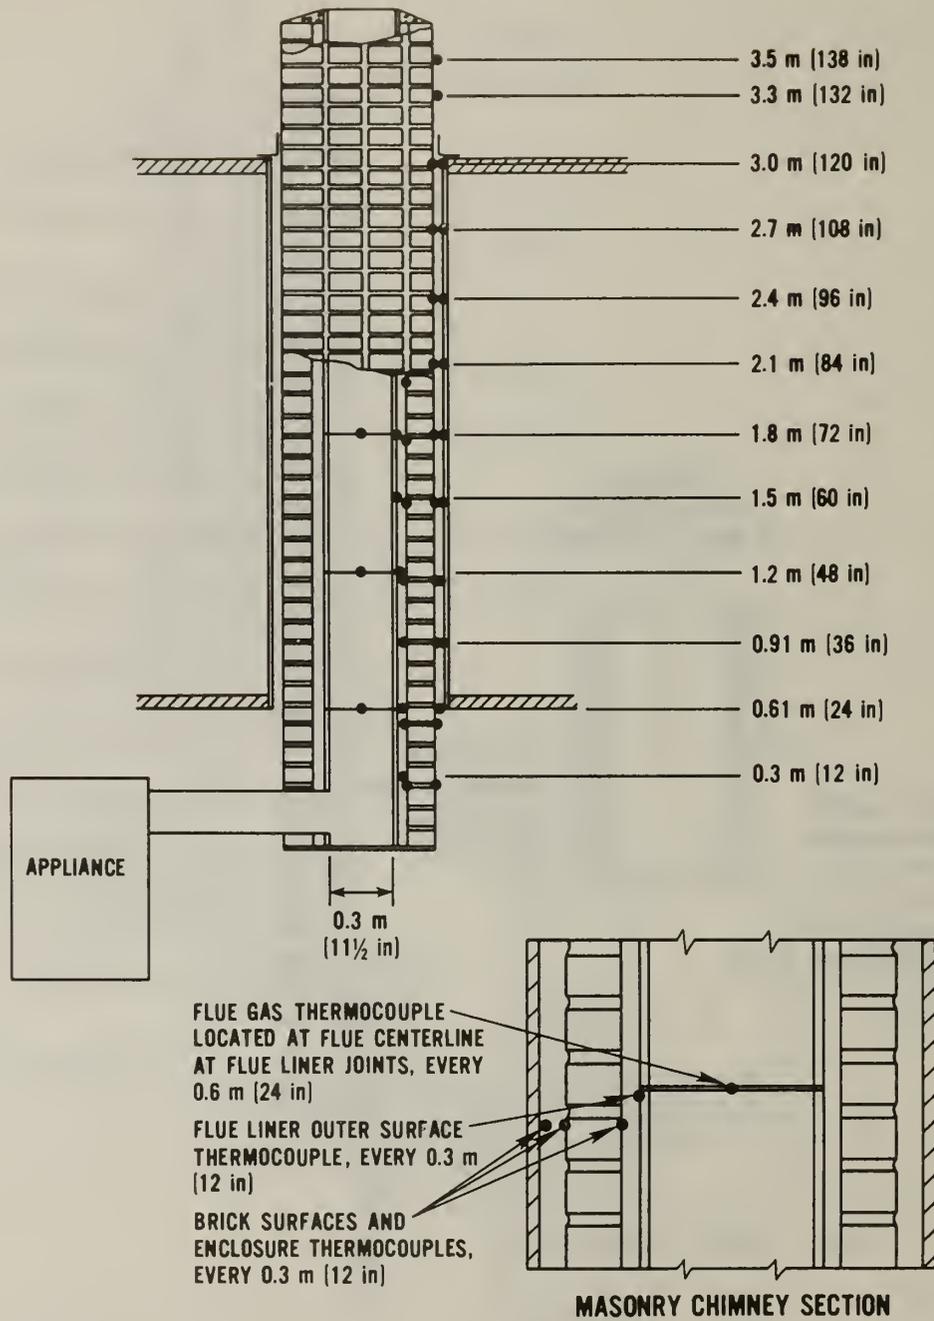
Instrumentation Locations for Tests of Masonry Chimney 3.
